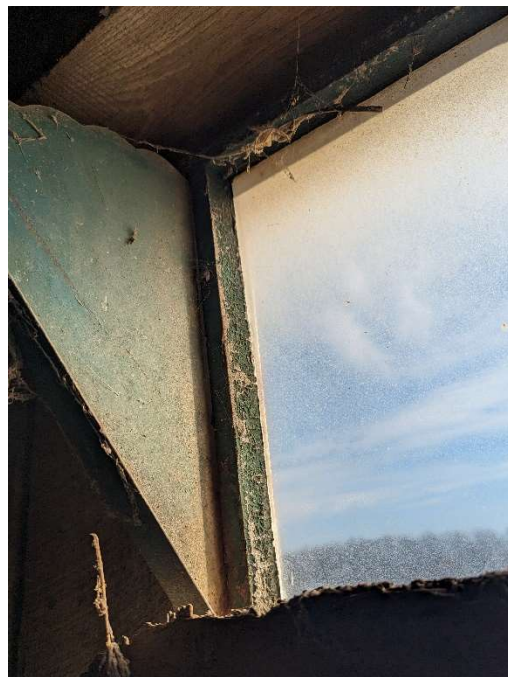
"Alligator texture" cracking green paint on exterior window frames. Numerous windows are present in barn exterior walls. Identified as potential lead-based paint.
